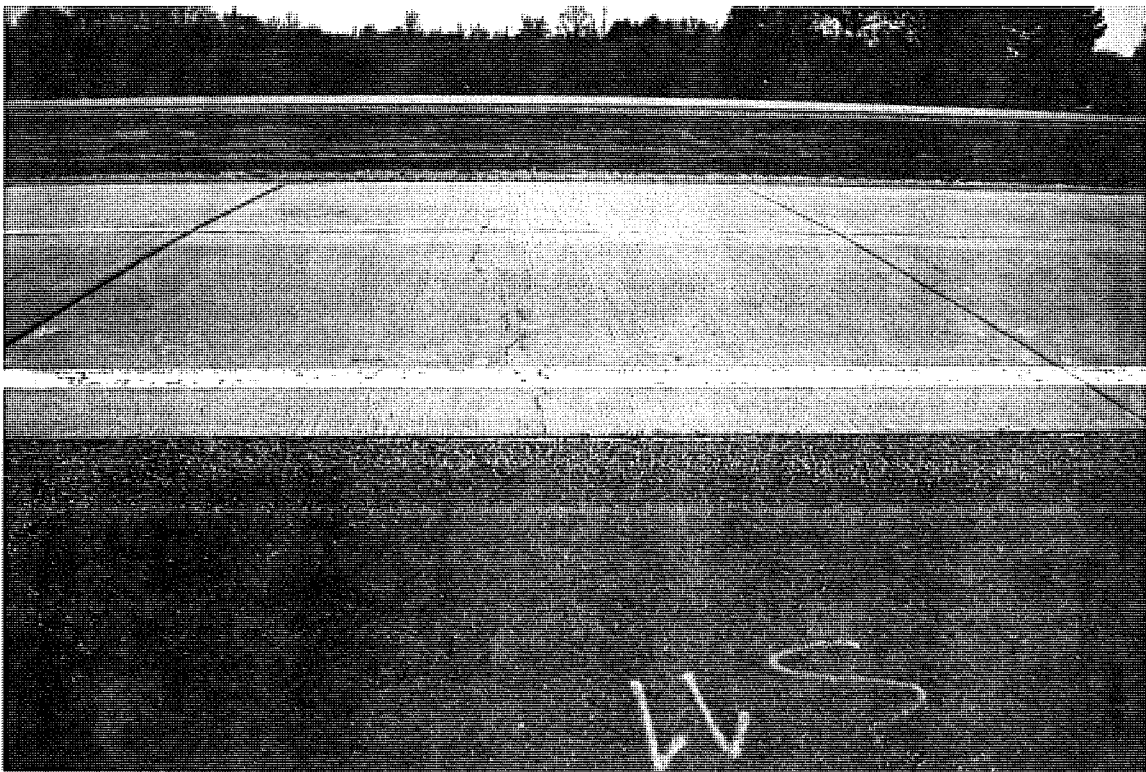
A full width transverse crack on CSN# 11017-32516A (Section C), EB. An expansion joint can be seen in the left side of the photo.
